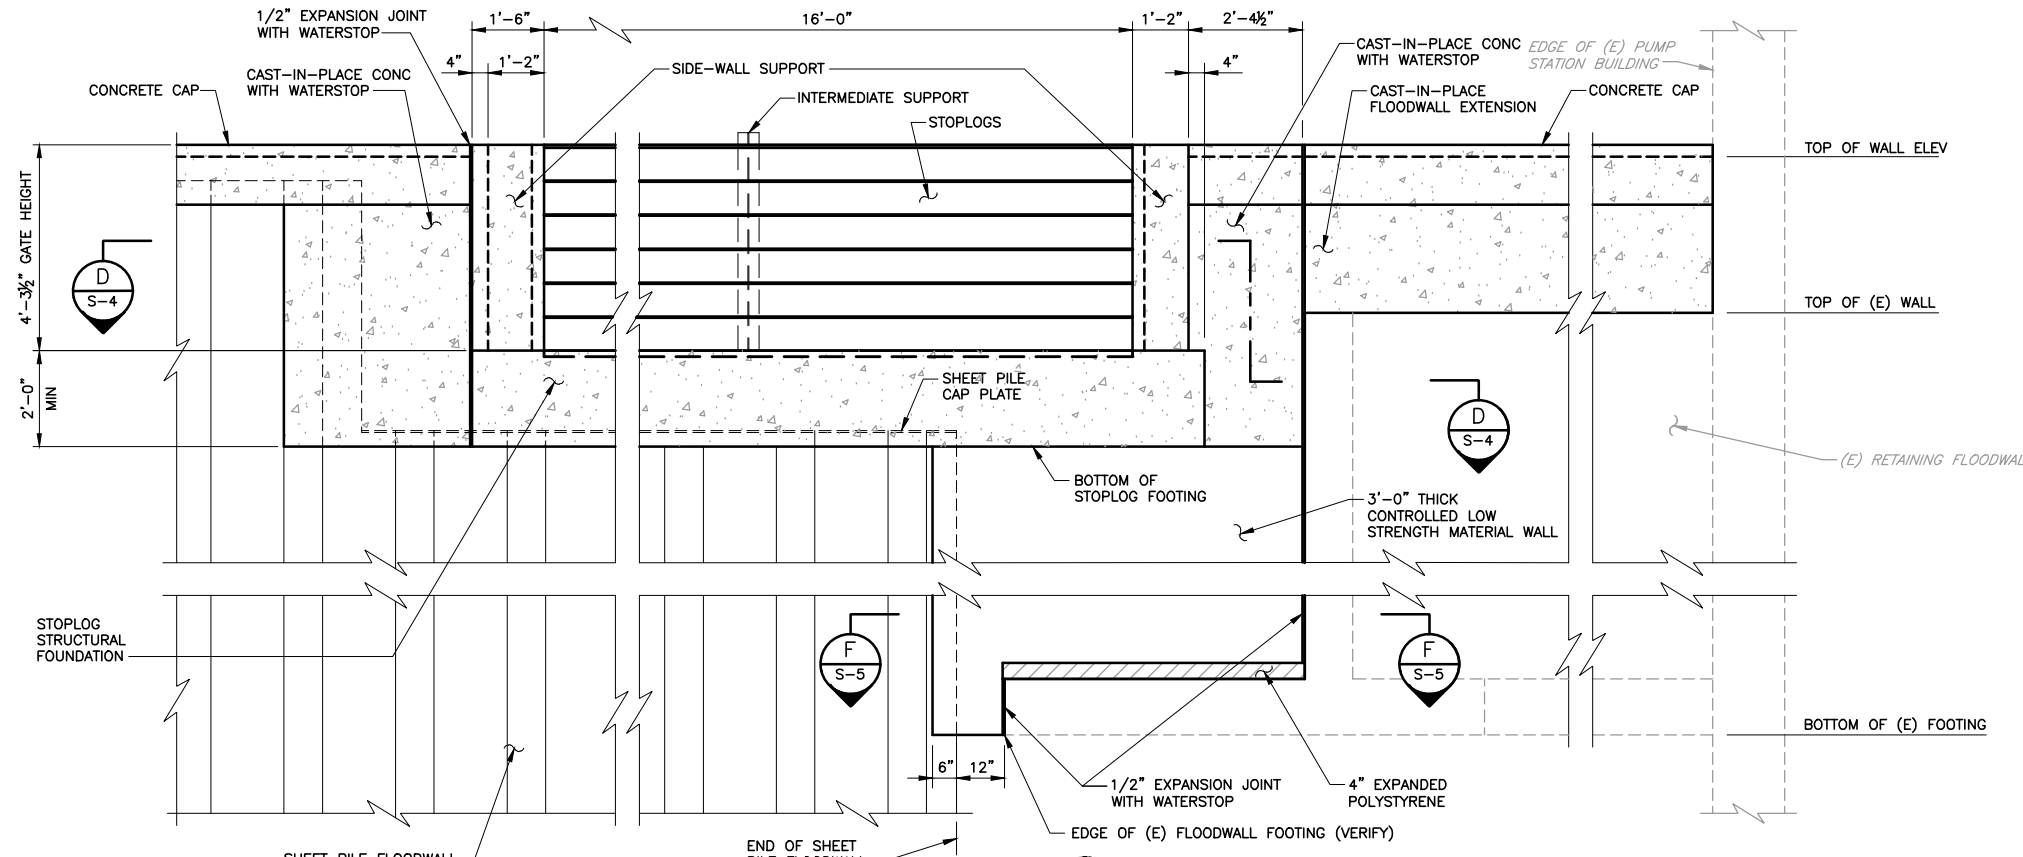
END FLOODWALL - (L-LINE) STA 71+05±
